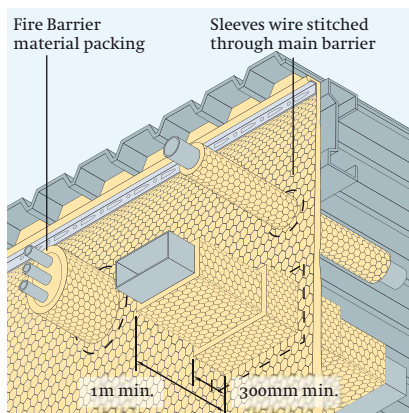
Penetration of Fire Barrier by pipework and ductwork. Length of pipe sleeving: 300mm for high melting point pipes such as steel or copper, 1,000mm for lower melting point pipes such as plastic or aluminium.
